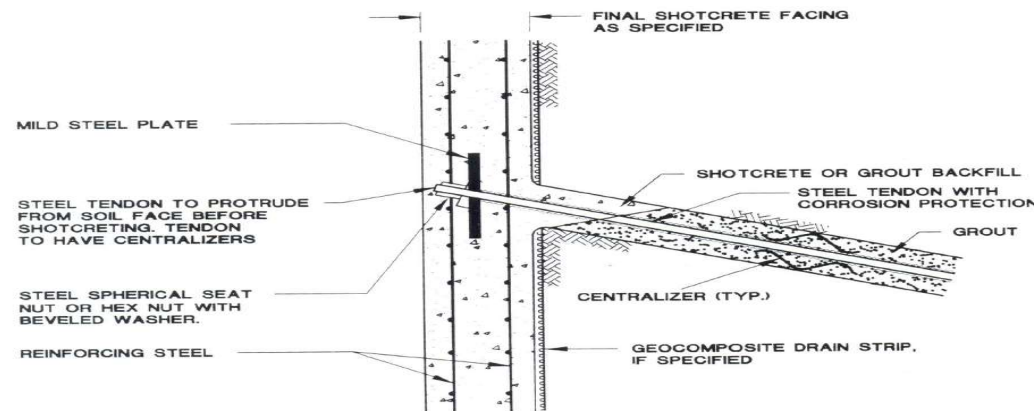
B. Typical Permanent Shotcrete Facing Detail.
